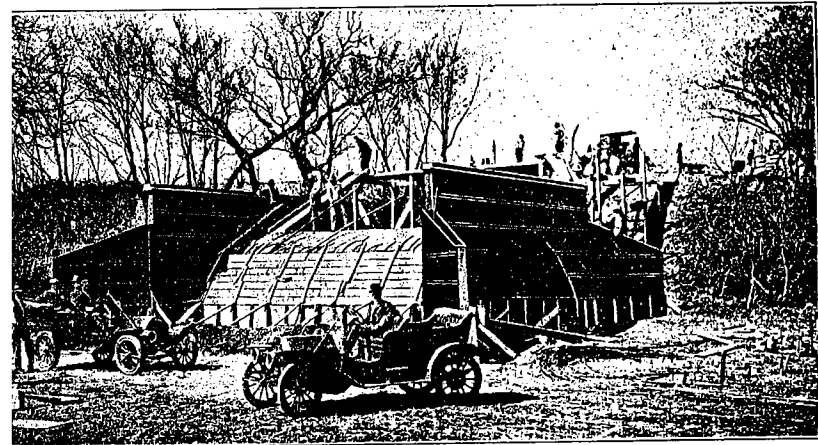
Steel Forms for Concrete Bridge at Oklahoma City.
